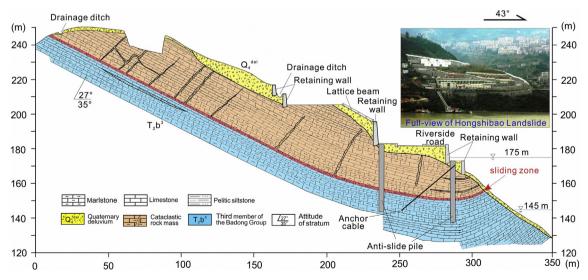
Cross section of the Hongshibao landslide, whose toe is affected by fluctuations of the TGR level. Drainage ditches, retaining walls, lattice beams and anti-slide piles were constructed to stabilize this actively creeping landslide.
